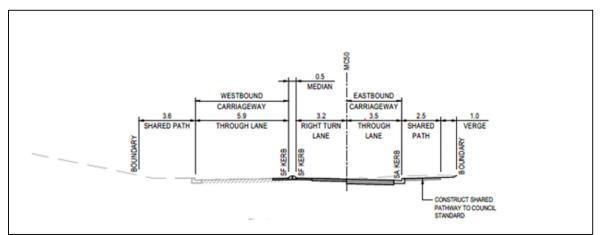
Proposed Typical Cross Section Yarrunga Street
